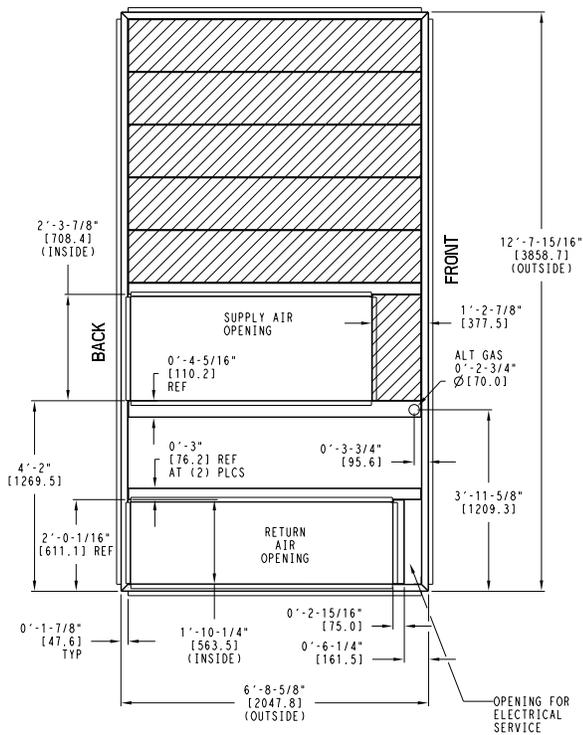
Roof Curb Details - 24 and 28 Size Units
